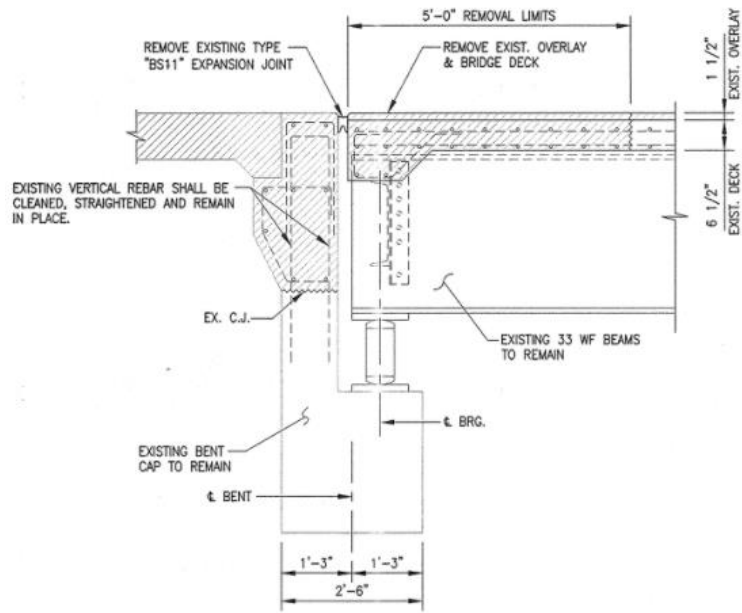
Abutment Detail of the Bridge (NBI 13000) (2002)
